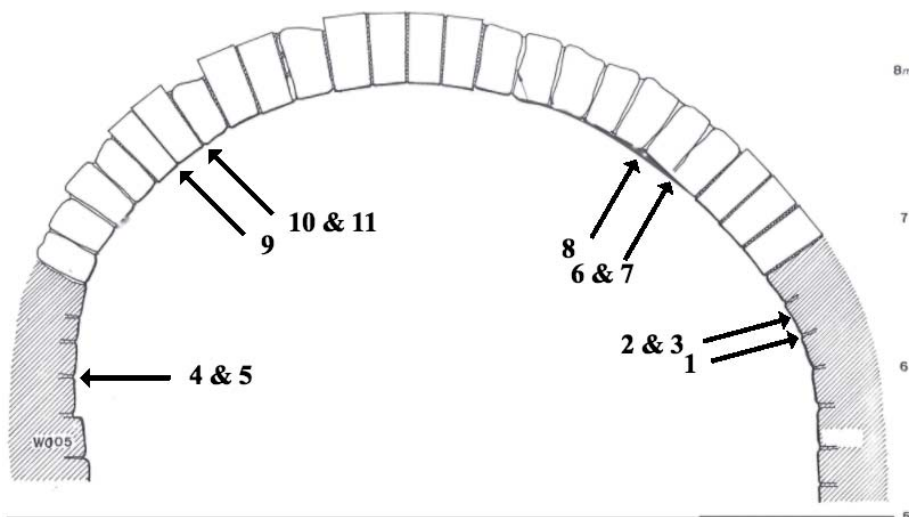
Elevations of Core Drilling, Vault 1. Modern Opening. Facing East. (Base Drawing Courtesy of Eng. Lilya Suchanov, IAA)
